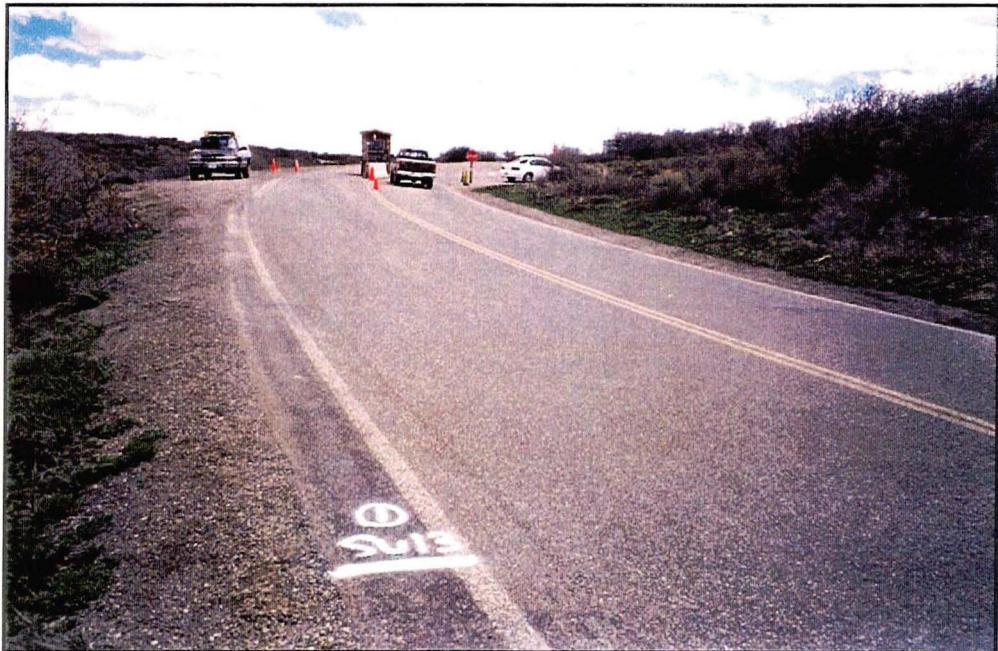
Section 1, Sample Unit 13 (MP 0.46)
